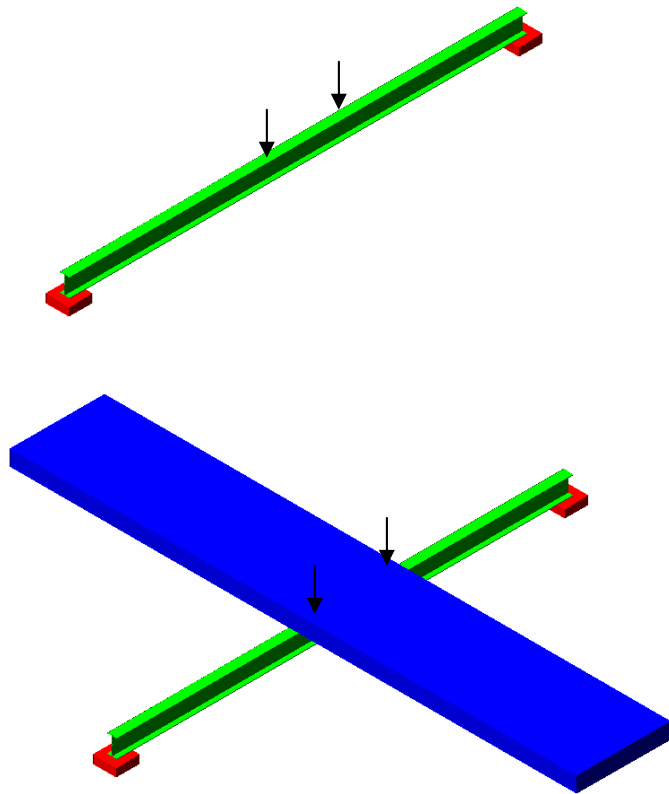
Lateral torsional buckling test 1 without floor slab (top) and test 2 with floor slab (bottom).
